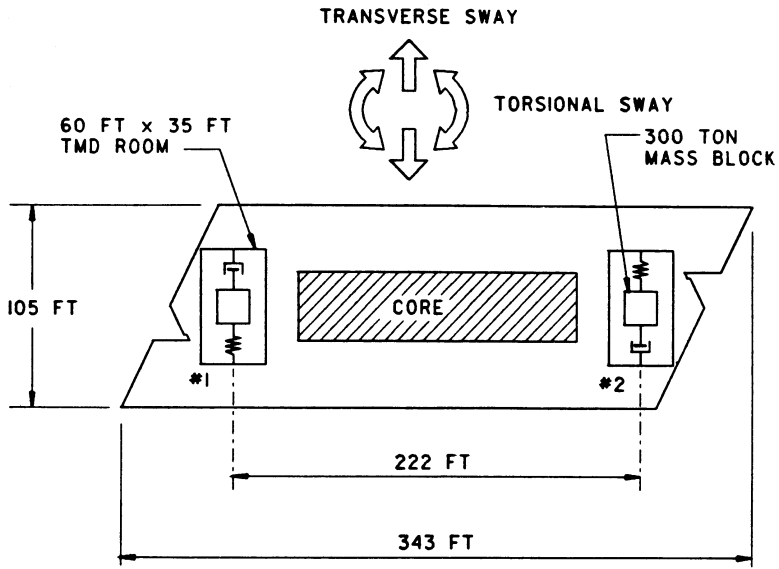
Dual tuned mass damper system schematic, John Hancock Tower, Boston
